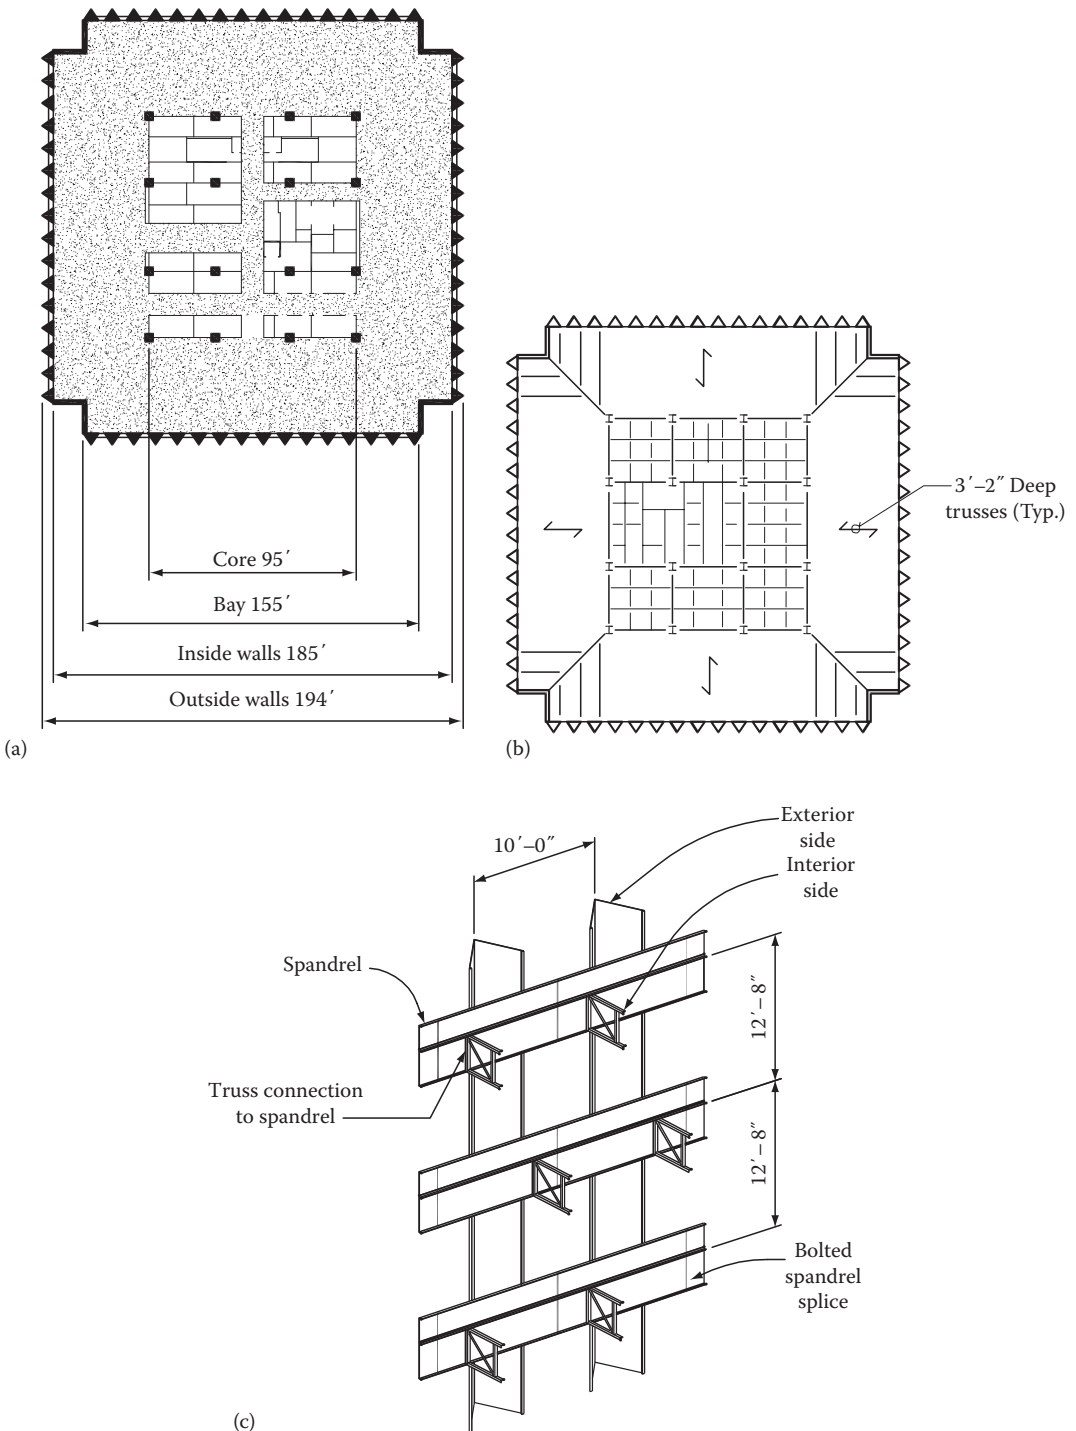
Standard Oil Building of Indiana, Chicago; (a) building floor plan; (b) floor framing plan, levels 3-19; (c) steel plate arrangement of exterior wall. *(Continued)
